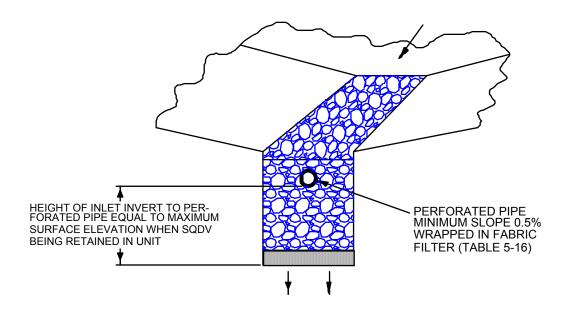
Illustration of Pipe Bypass in Infiltration Trench
